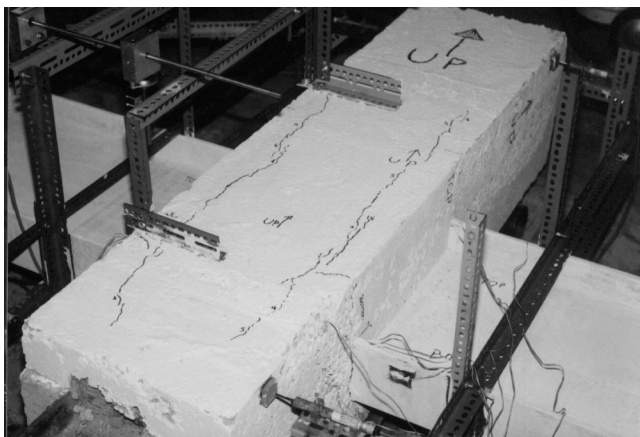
Crack pattern at the onset of concrete-encasement damage for Specimen 1.
